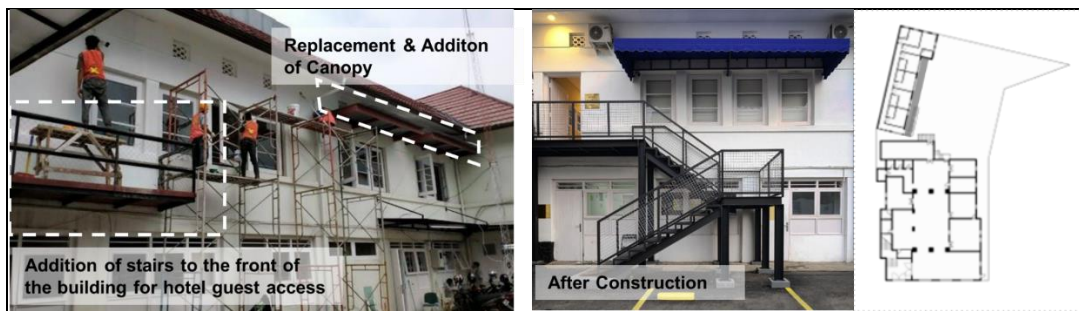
Transformation of Back Building (Hotel) Facade of Gas Block Hotel
